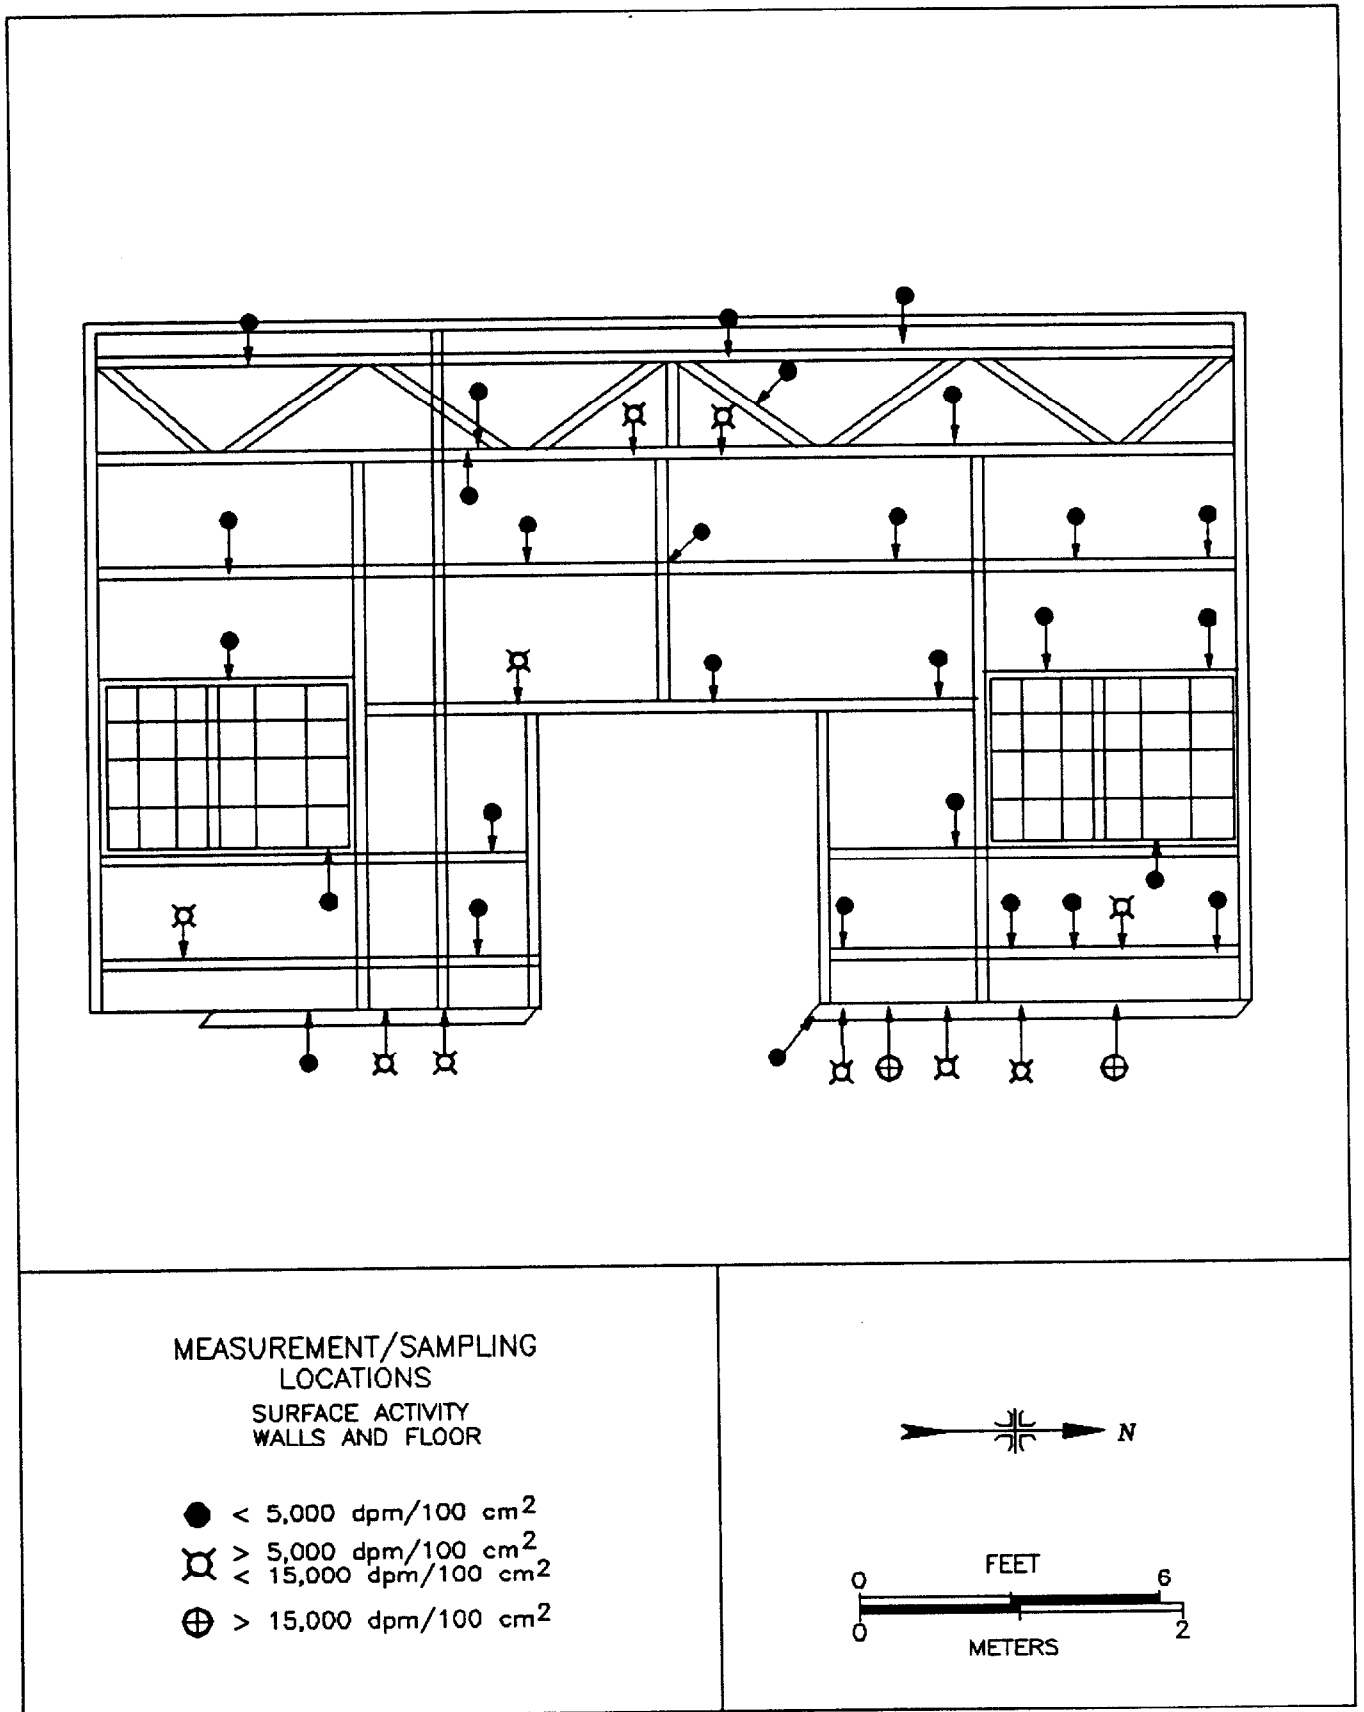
Building 8, Room B, West Wall - Measurement and Sampling Locations
